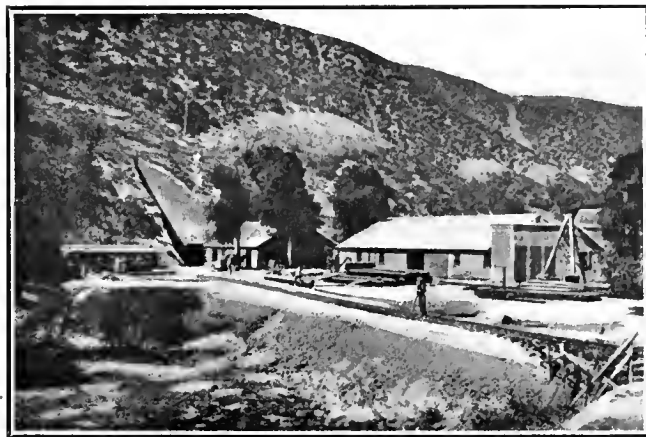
SOUTH PORTAL, ELIZABETH TUNNEL
